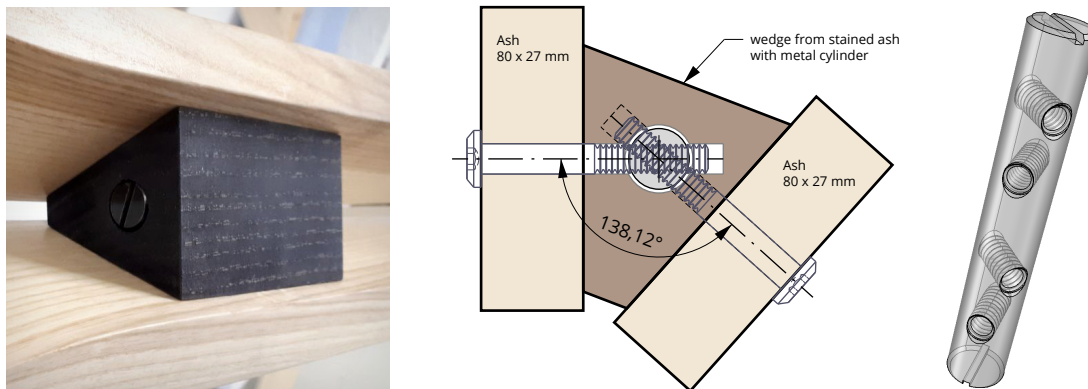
Left: photograph of a wedge. Center: cross section of the wedge between two frames. Right: rendering of the metal cylinder with four threads to hold the connecting screws.
